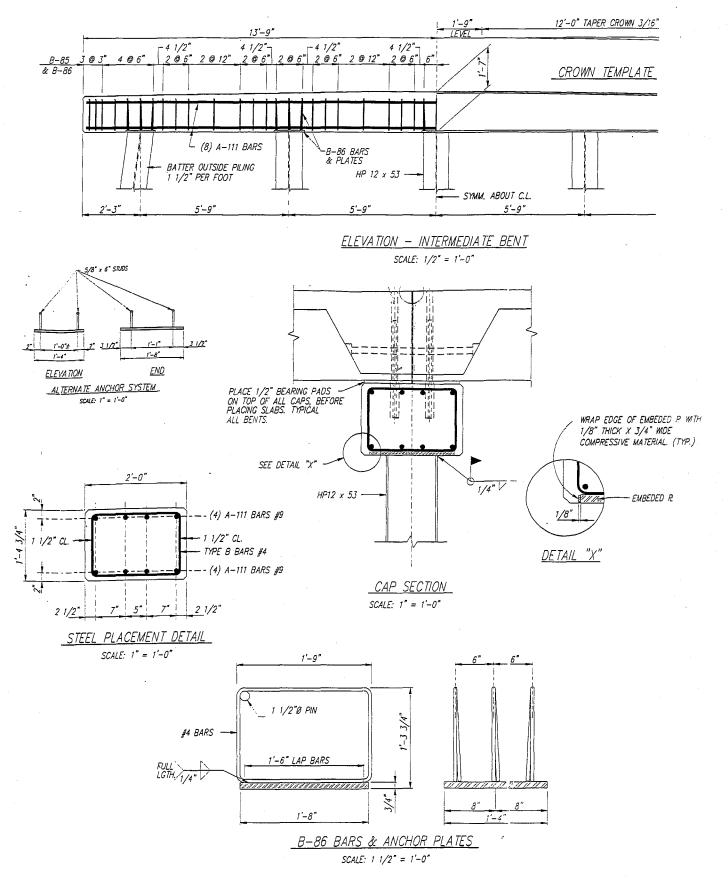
Pile Connections by Anchor Plates to Bent Cap
